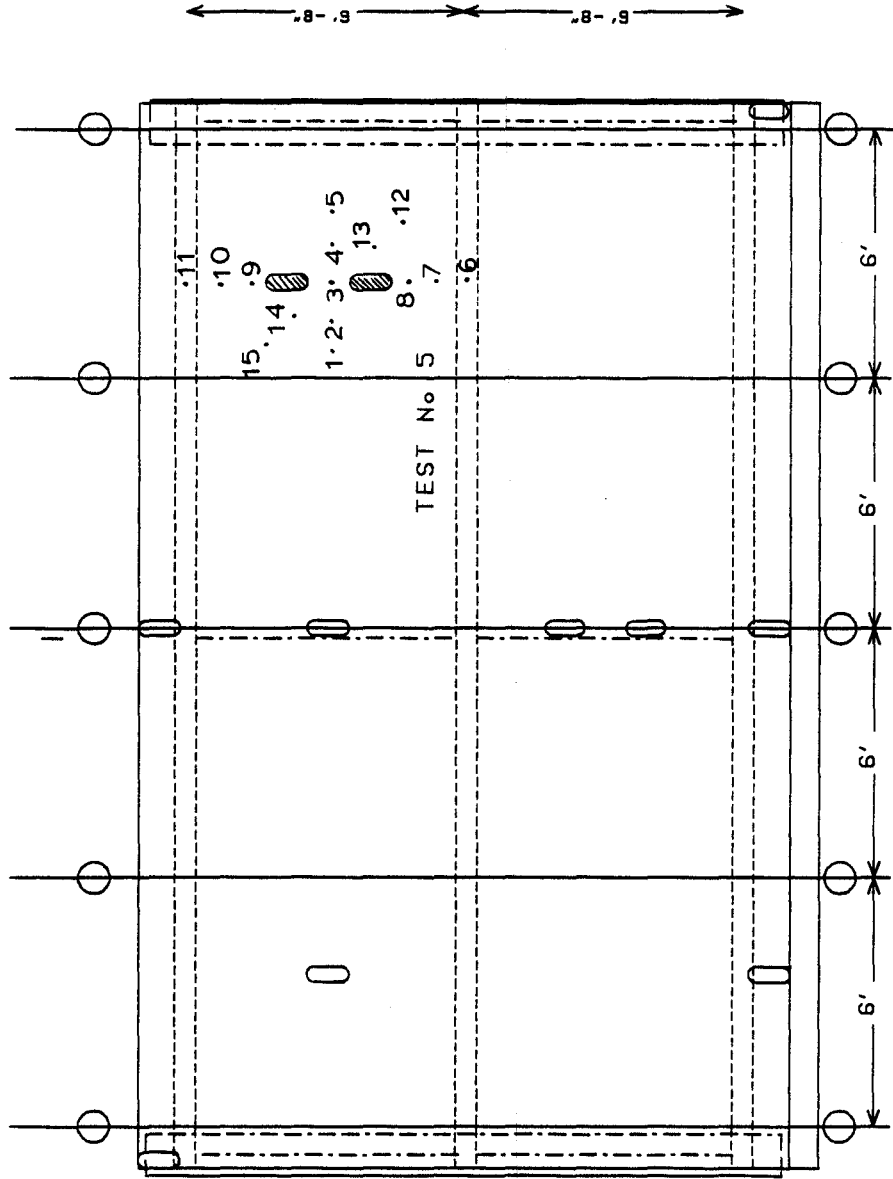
LVDT Locations (First Bridge - Test No. 5)
